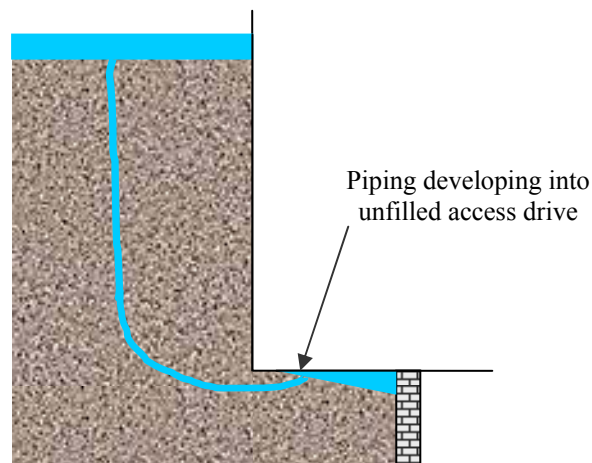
Piping development in hydraulic fill due to unfilled access drive
